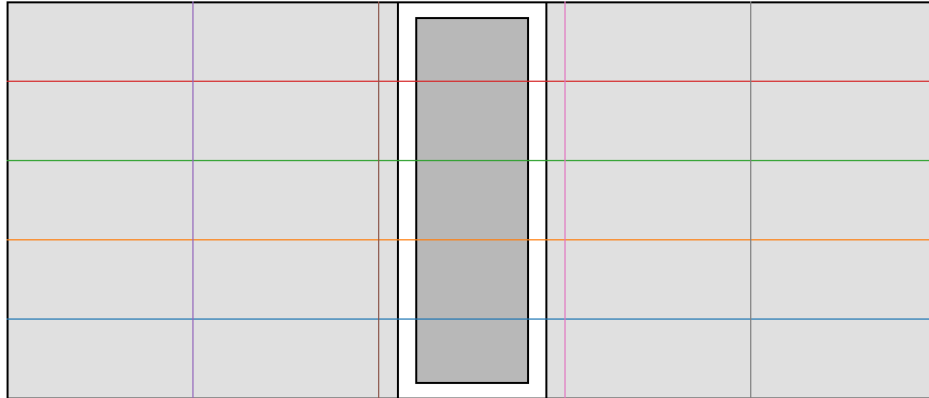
Ashlar wall with concealed flue, timber floor pocket, later infill and room-side closure. Author's original schematic. A surface patch can leave a connected vertical acoustic path.
